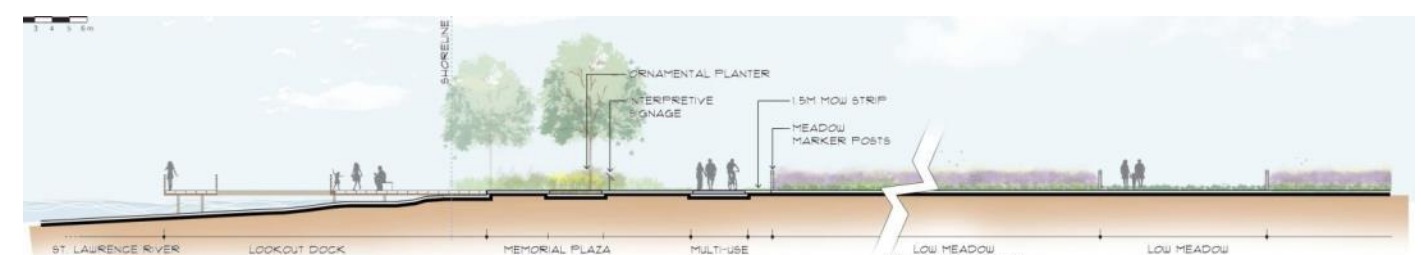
Site section at Waterfront Promenade, showing 'Deck-Plaza', riparian edge, Waterfront Trail and Commemorative Meadows (See Appendix A.6. for more detailed site sections)
